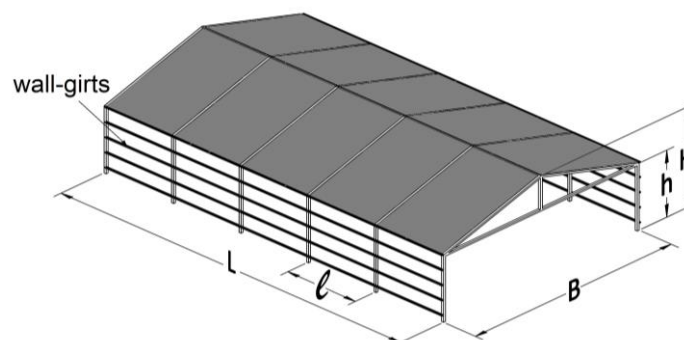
Geometry used to describe full-scale and small-scale model in this work.
